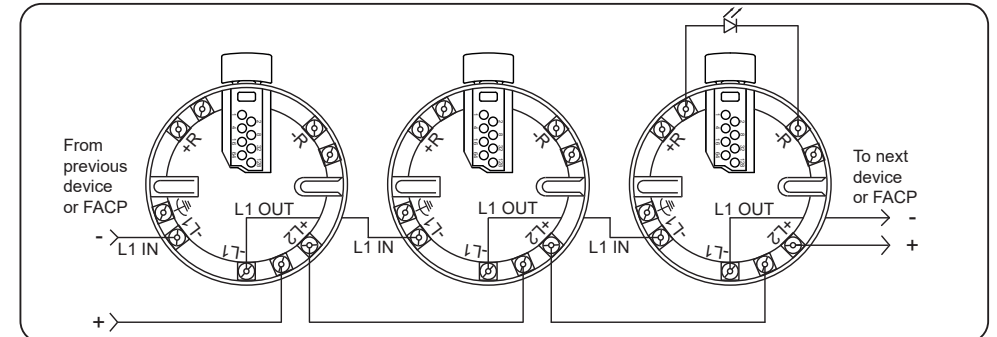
Schematic Wiring Diagram: Soteria UL Base wiring with remote LED connection. To be used with new installs for XP95A and Soteria UL detectors
